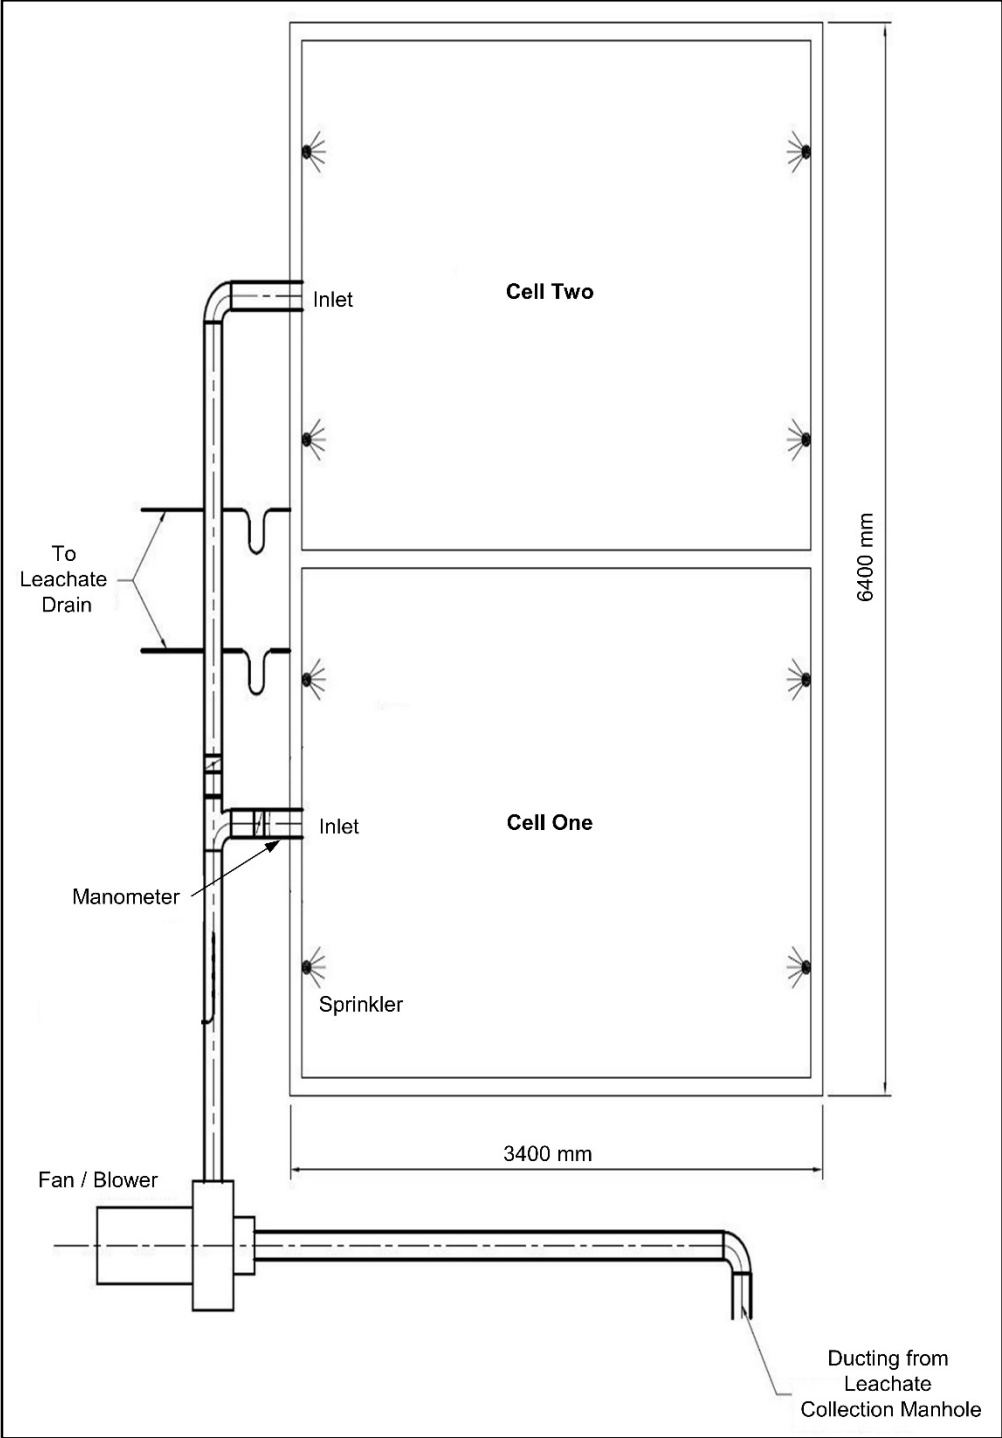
Schematic Plan View of the Biofilter at Levin Landfill
